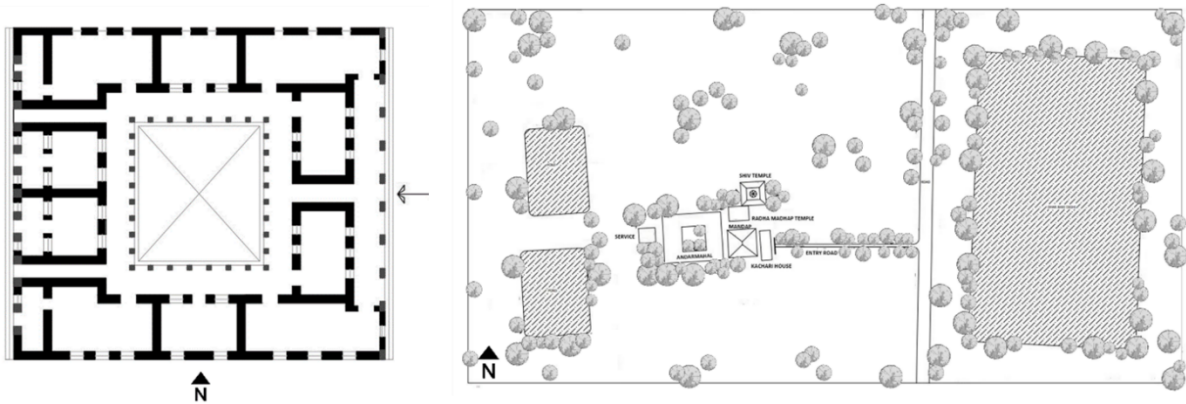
Ground Floor Plan of Andarmahal (left) and Original and Existing Roof Plan (right) (Source: Author).
